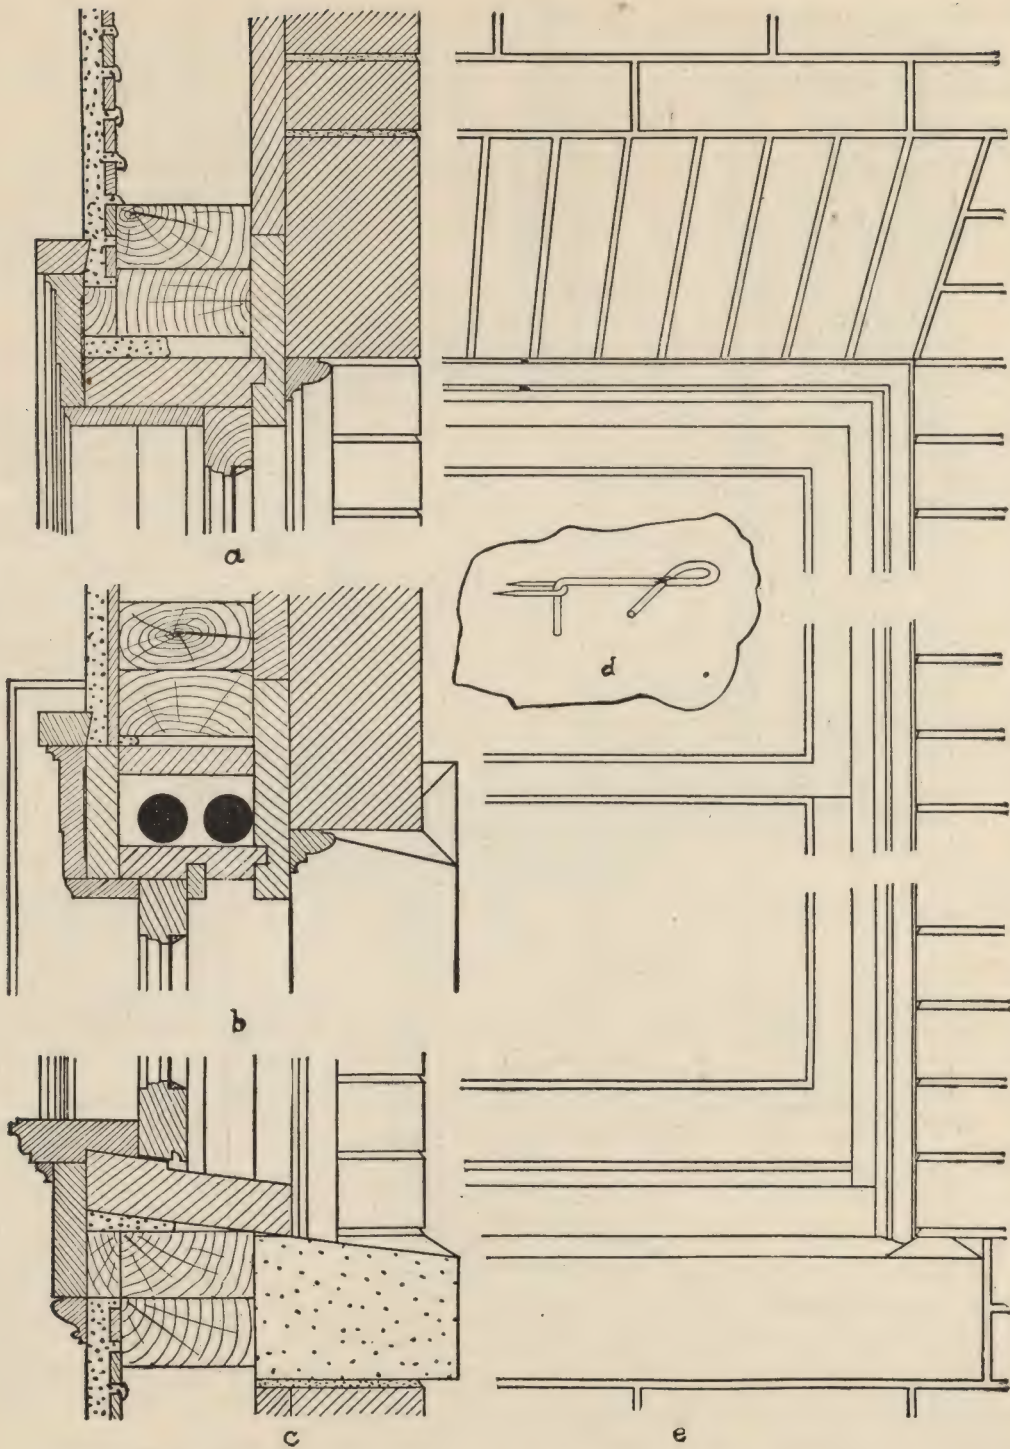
DOUBLE-HUNG WINDOW IN BRICK-VENEER WALL.
